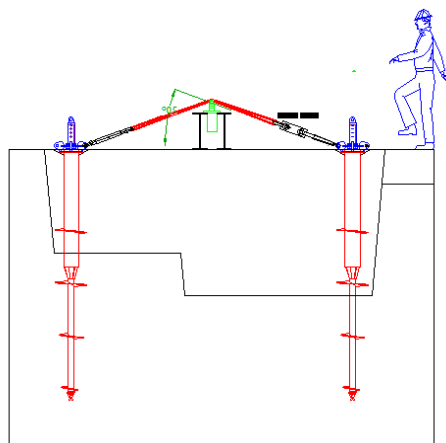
Schematic view of the test pit used for helical screw piles, with Anchor A on left and Anchor B on the right
